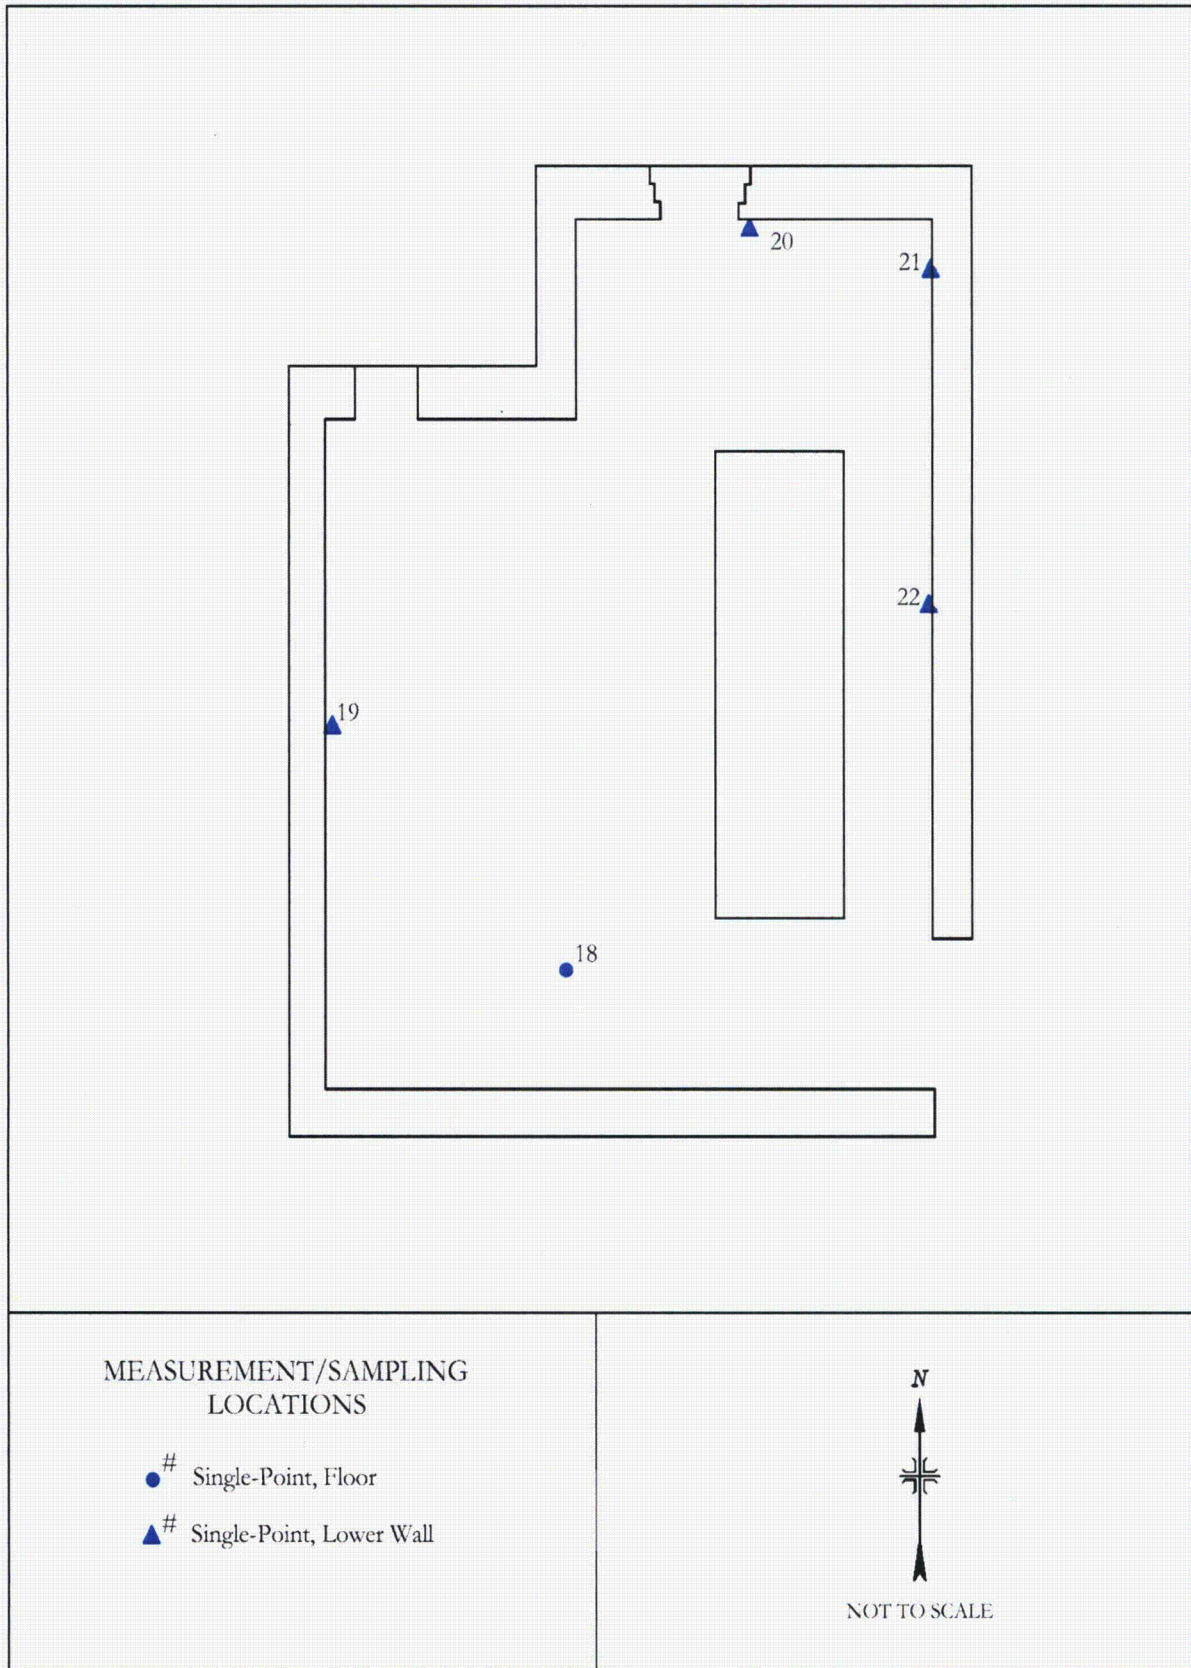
Auxiliary Building, Room 44 - Direct Measurement Locations
